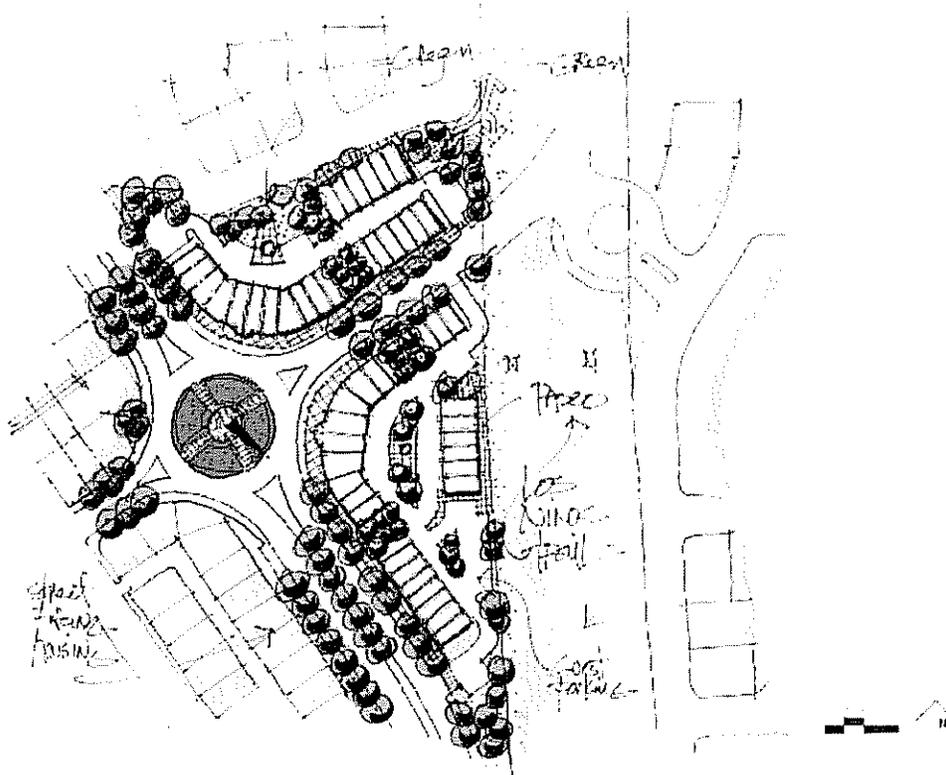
Schematic Live-Work Development Plan (Planning Area 22).
